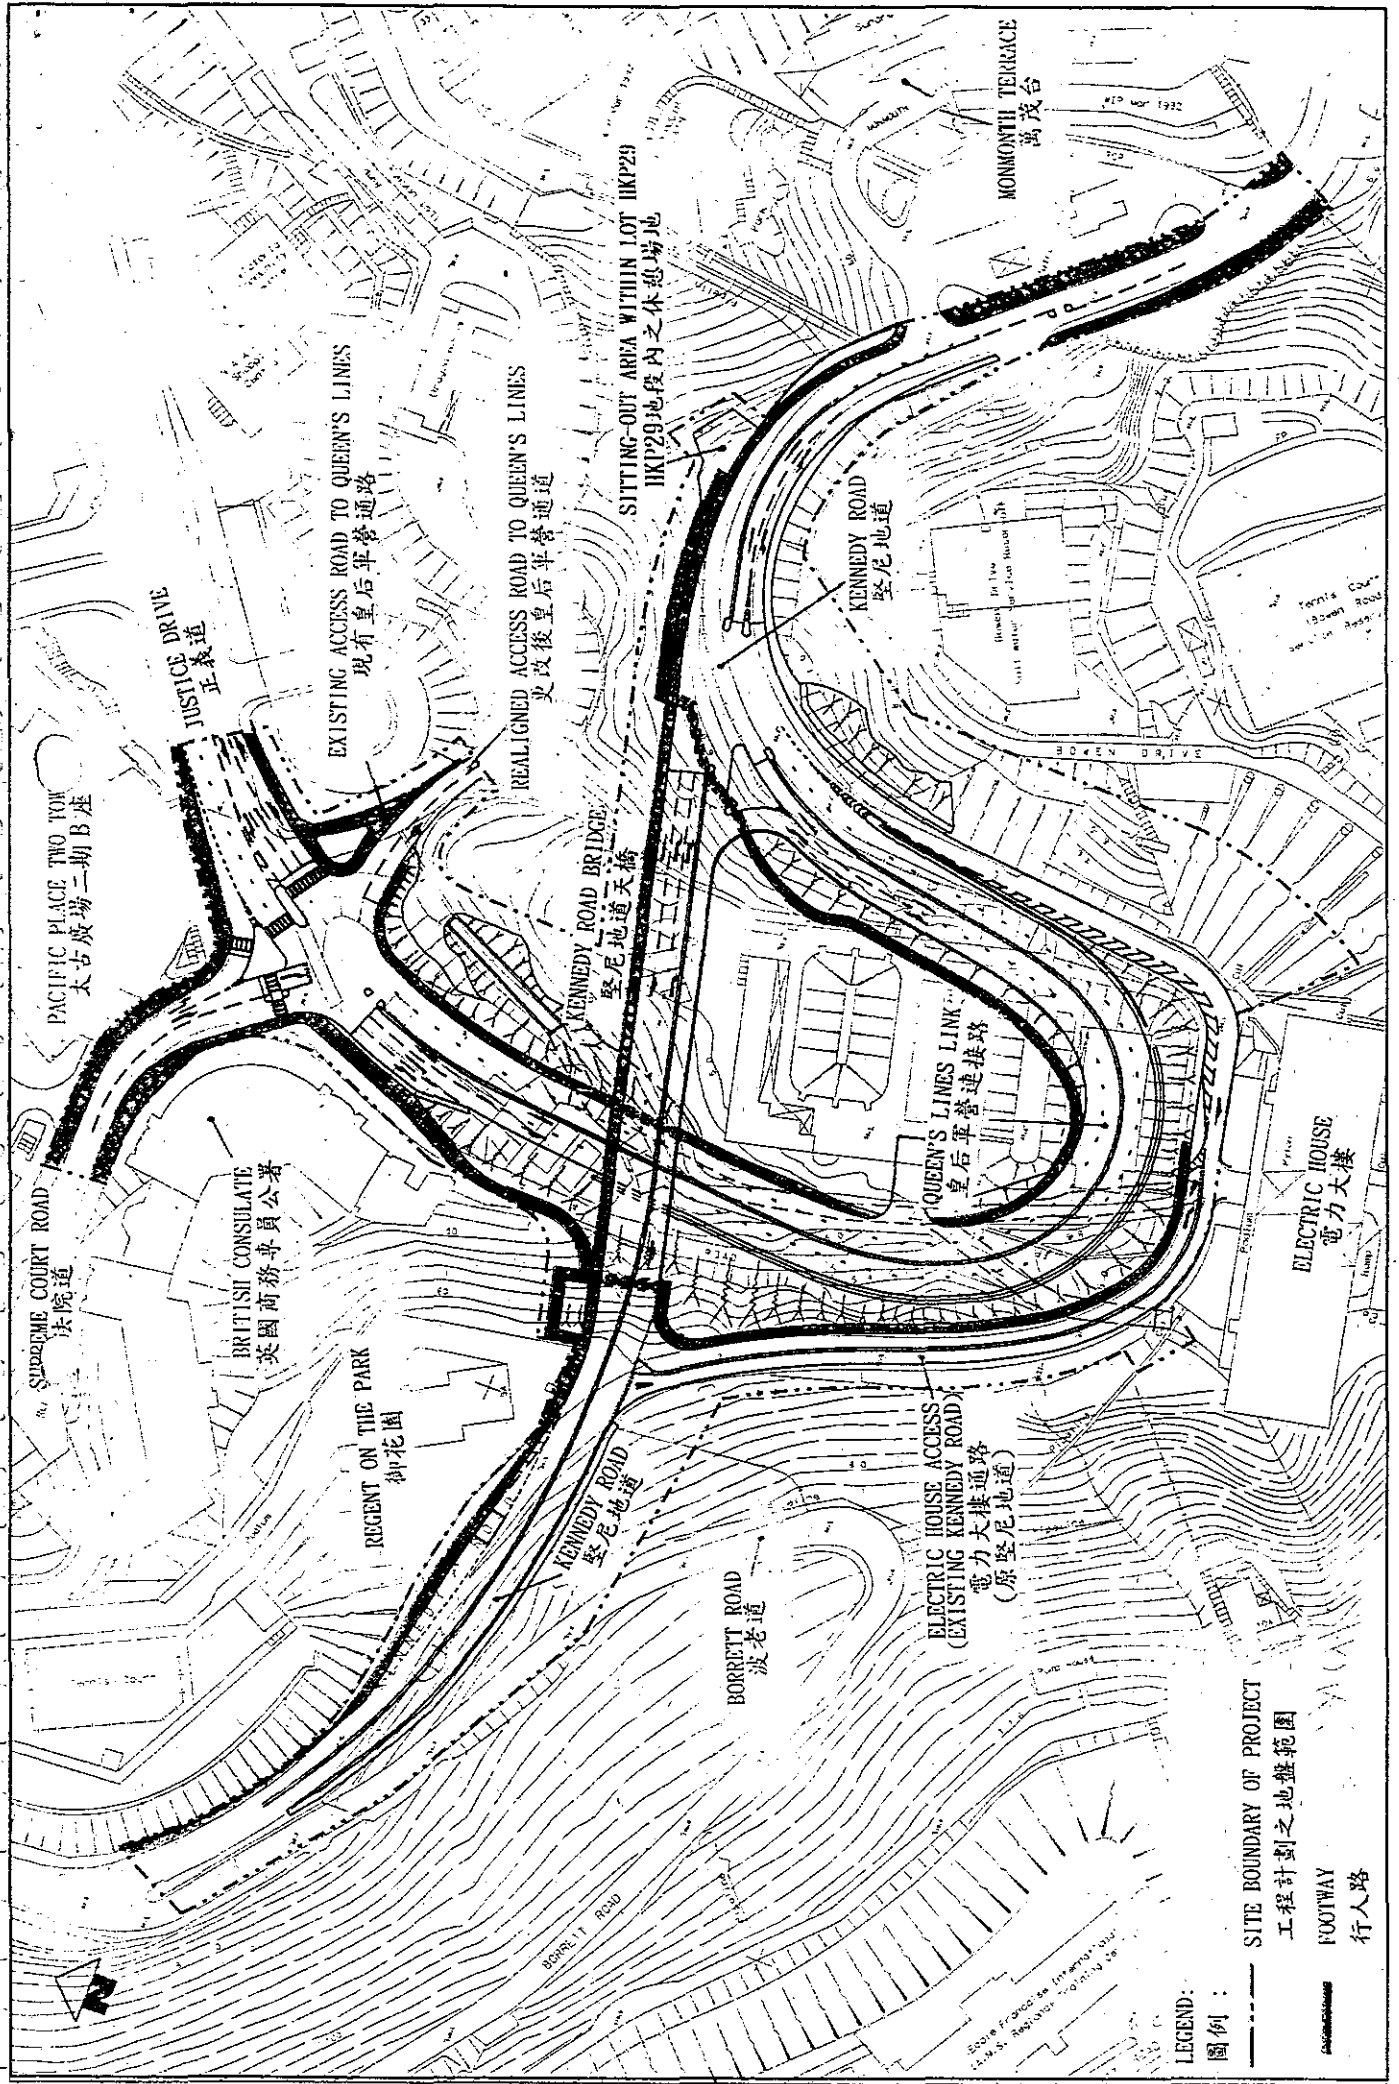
WORKS LIMIT OF PROPOSED ROAD IMPROVEMENT WORKS
